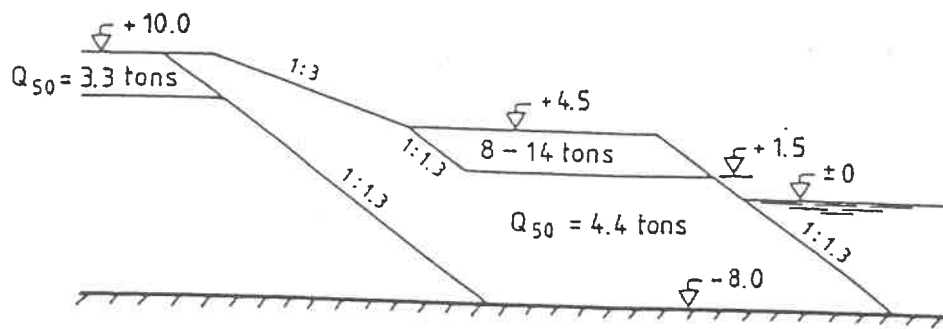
Typical cross-section for berm breakwater on Rennesøy. All measures are in metres.
